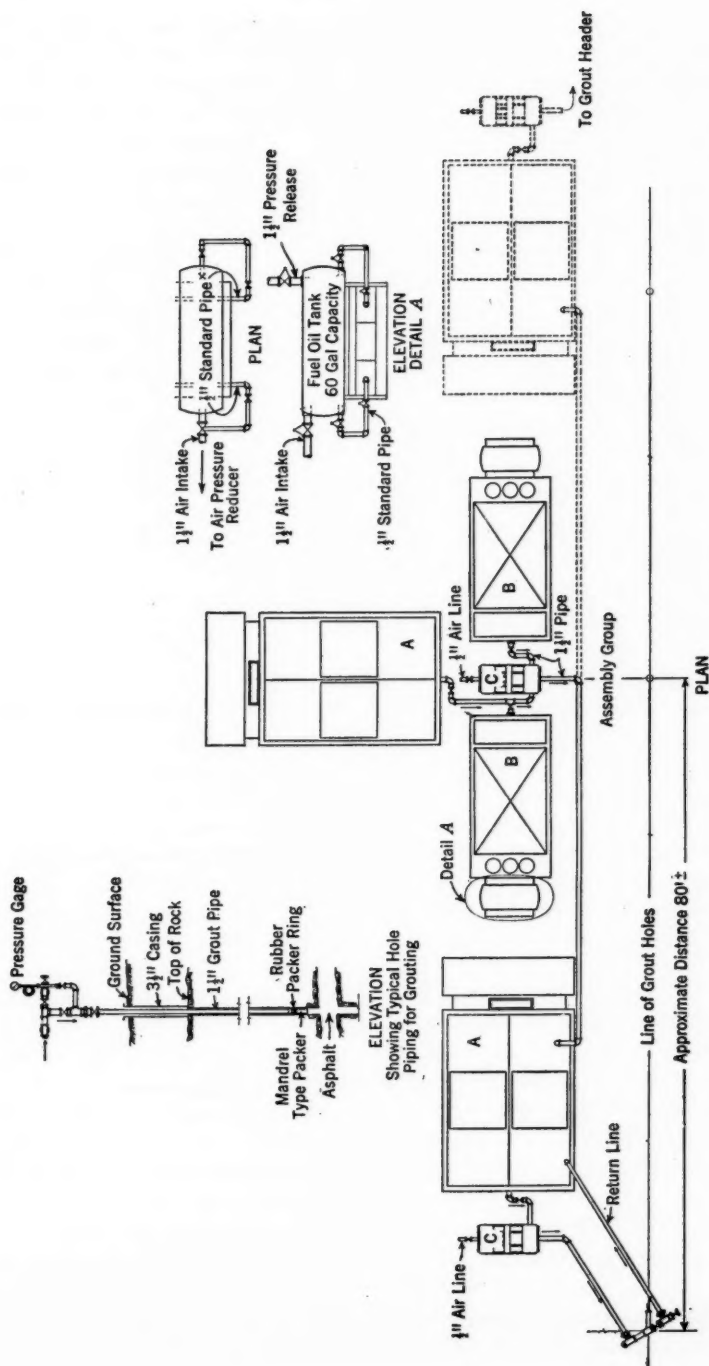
ASPHALT-GROUTING EQUIPMENT
